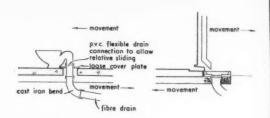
(left), rainwater pipe discharging over open gulley. One method of disconnecting the building from the extending and contracting ground.
